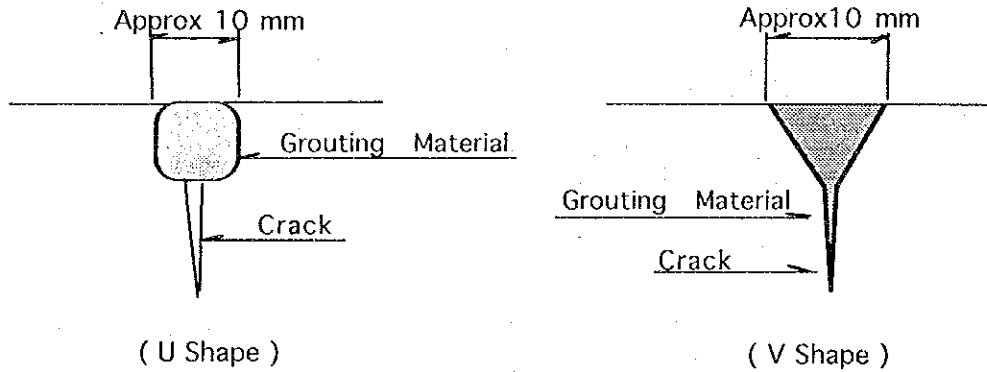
Repair Method When Reinforcing Bar is Not Corroded
